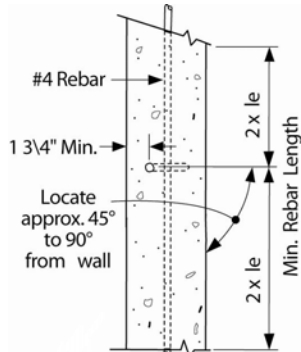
SB ANCHOR BOLT INSTALLATION—CONTINUOUS STEM WALL
